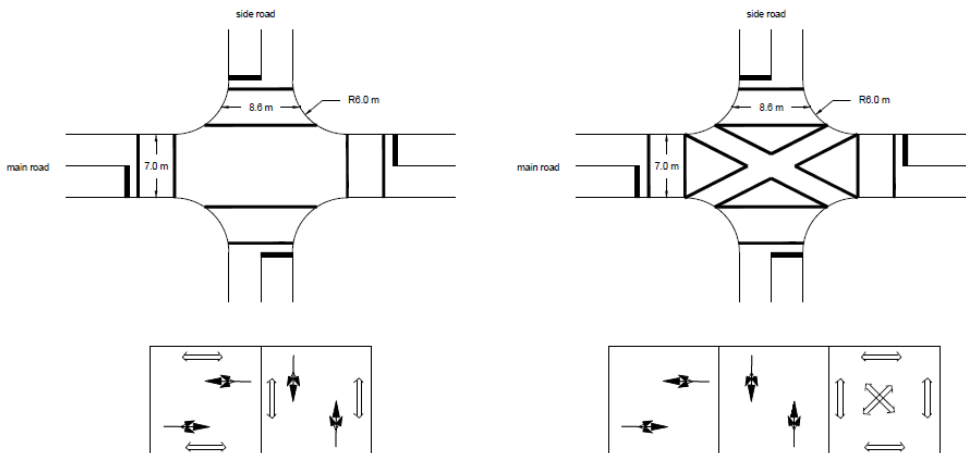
Intersection layout with different signal plan types: tradition signal plan (left) and EPP signal plan (right)
